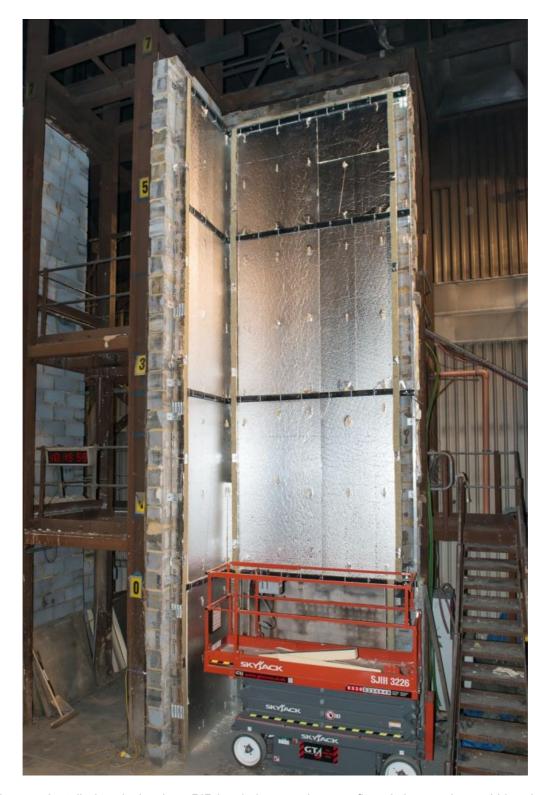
Installed cavity barriers. PIR insulation panels cut to fit and skewered onto 'L'-brackets. Note: Insulation panels have not yet been fixed to masonry.
